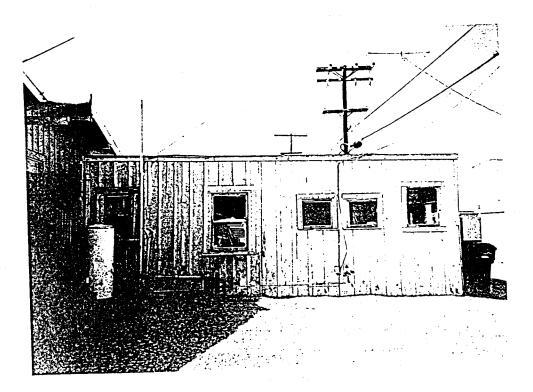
706 Manhattan Court "The Turquoise House" East Elevation
